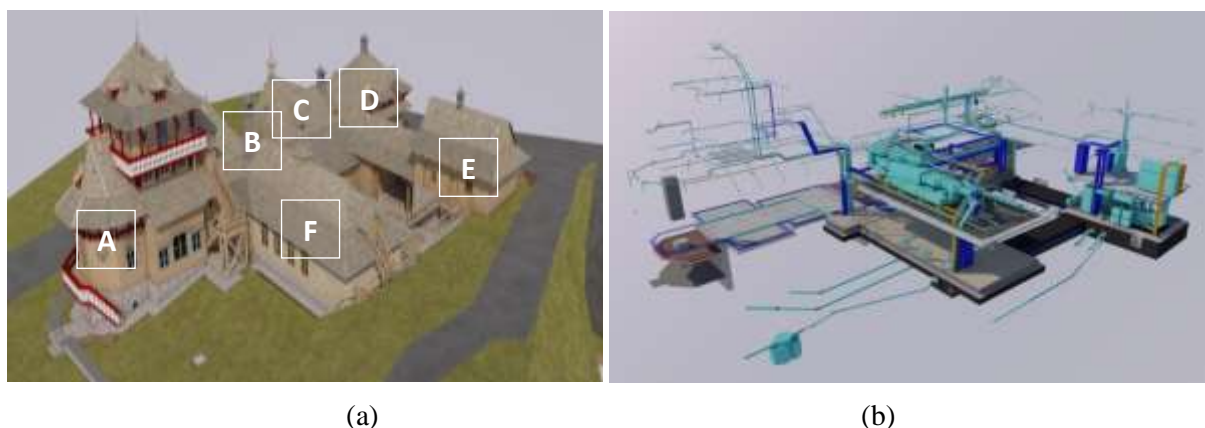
(a) The Libušín areal: A) dining room with lookout tower, B) neck, C) pub, D) Parma extension, E) Pustevka, F) kitchen; (b) Design of SFEE layout and fire alarm system in BIM (Masák & Partner, s.r.o., 2021).
